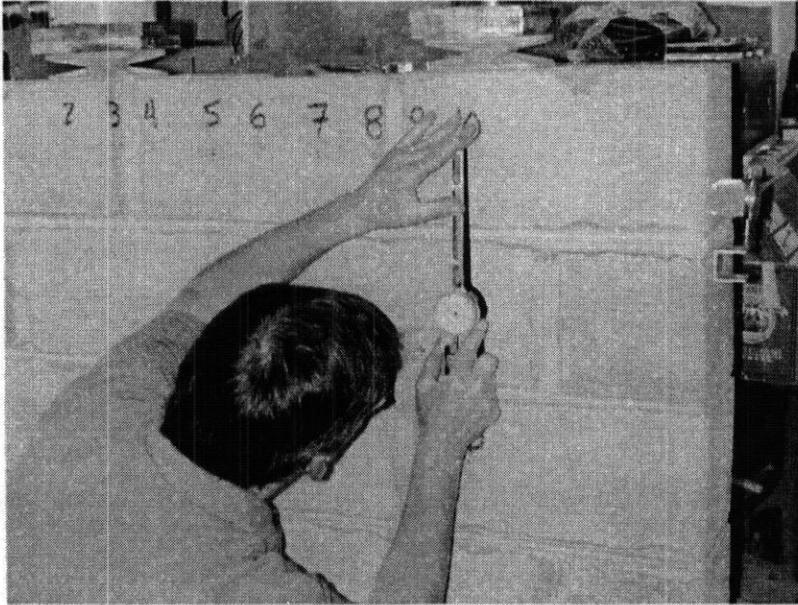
Laboratory tests of bond beam anchorage. The top course is a fully grouted, horizontally reinforced bond beam constructed with 8-inch concrete block. Strains were measured with a dial gage at 10 points between the two tendons (top of photograph).
